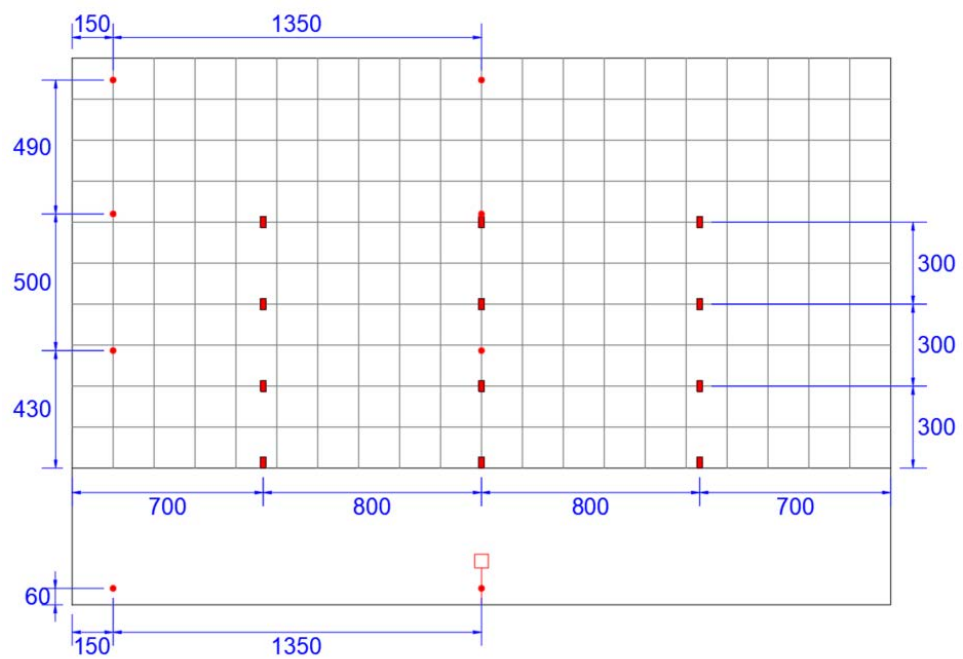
Rear view (compressive side) of the specimen showing instrumentations
